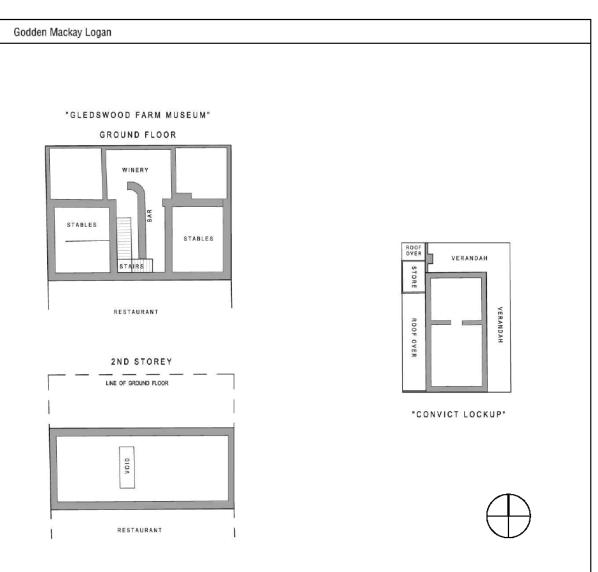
Plan showing the room configuration in the former coach-house and stables and the former convict lockup. (Source: YSCO Geomatics Land Resource Consultants, 10 January 2008)
